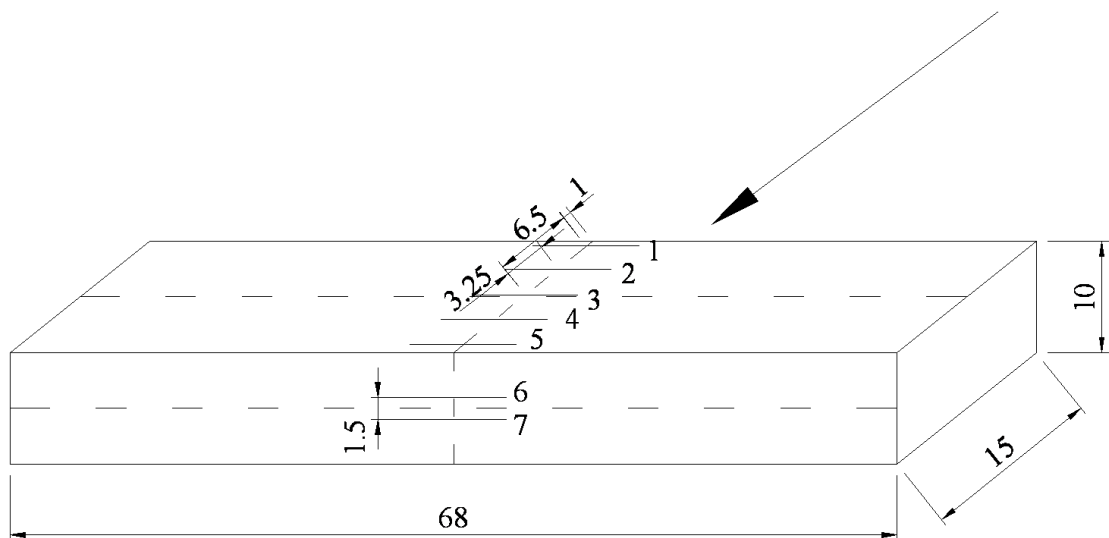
Measure point's location on the surface of concrete (unit: cm).
